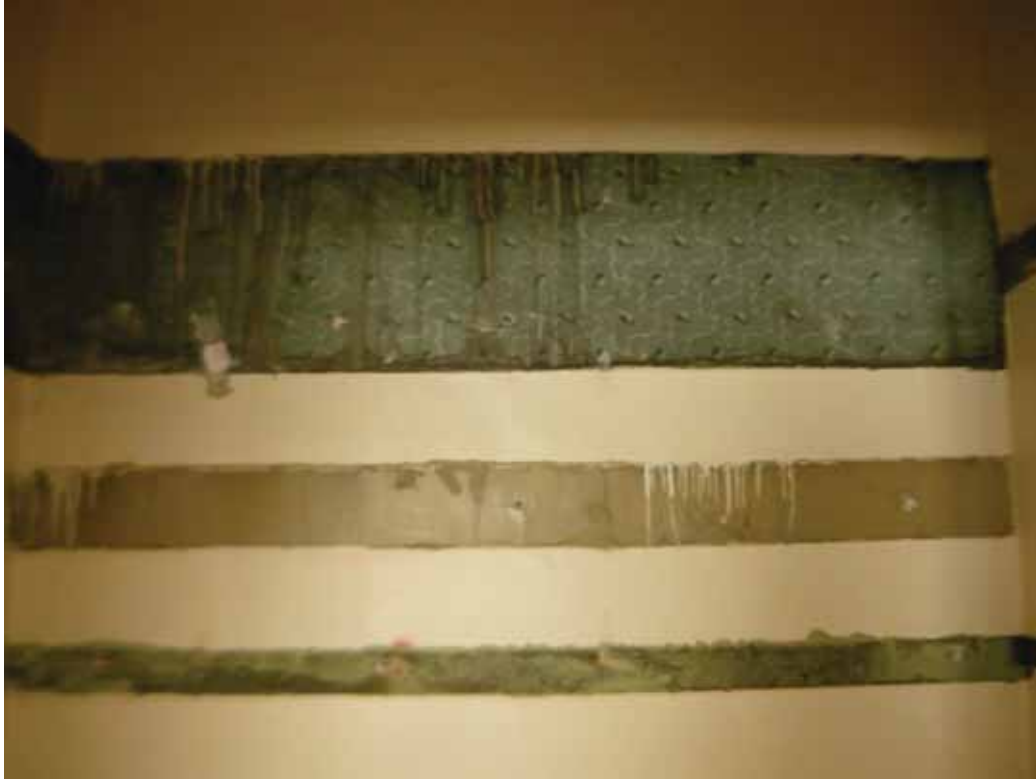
Wallpaper in the cupboard at the south end of the east wall in Room S95, looking east (EAF10 BHD2 (73))
